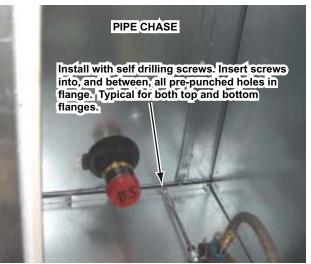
SCREW PIPE CHASE TO AIR HANDLER TOP AND BOTTOM INTERNAL FLANGES
